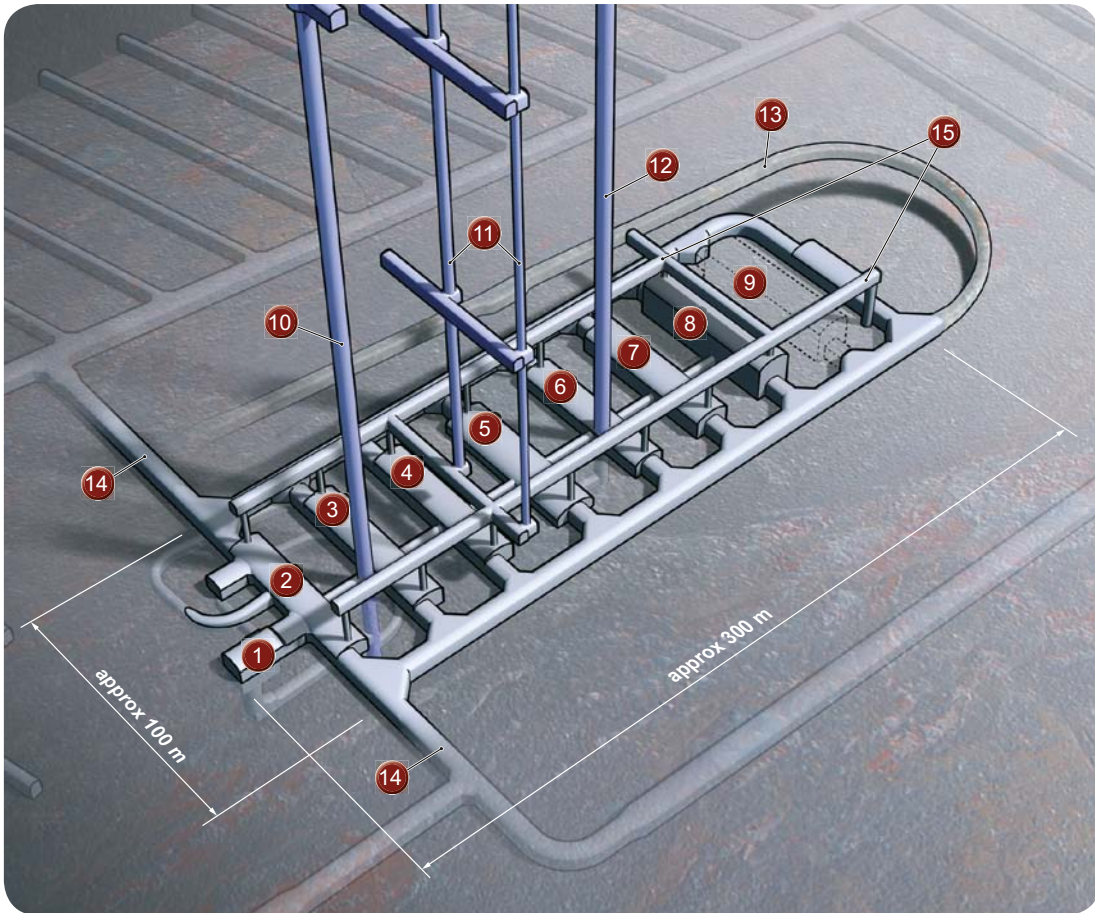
The different parts of the central area 1. Rock loading station 2. Rock hall 3. Skip hall 4. Electrical hall 5. Vehicle hall 6. Elevator hall 7. Storage and workshop hall 8. Transloading hall 9. Extra space 10. Skip shaft 11. Ventilation shaft 12. Elevator shaft 13. Ramp 14. Transport tunnels 15. Ventilation tunnels.
